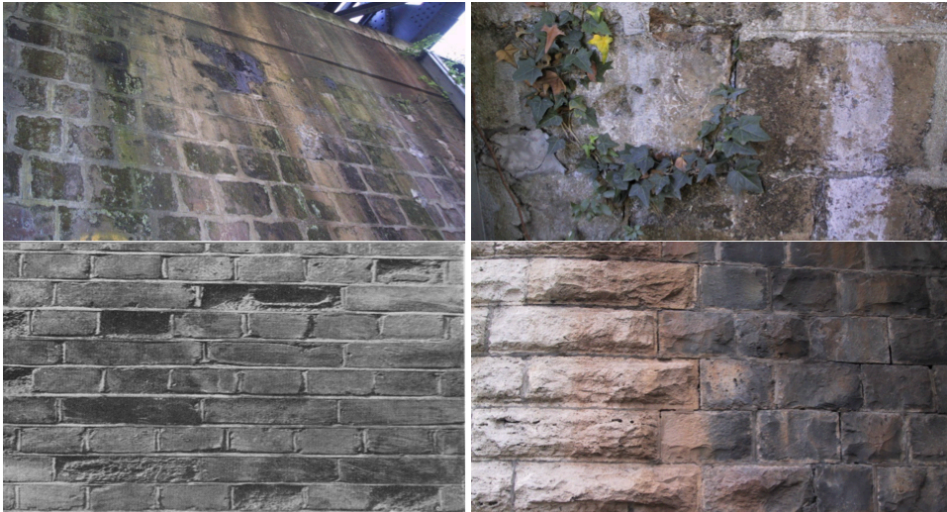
An overview of possible defects detectable on masonry/stone bridges.
